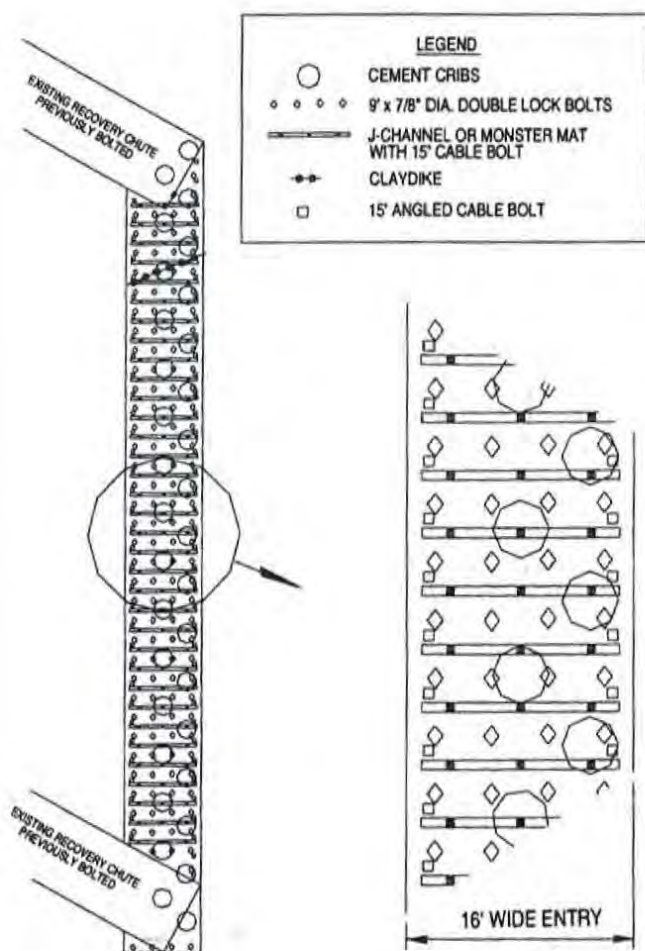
Plan view of the standing support and internal roof reinforcement system.
